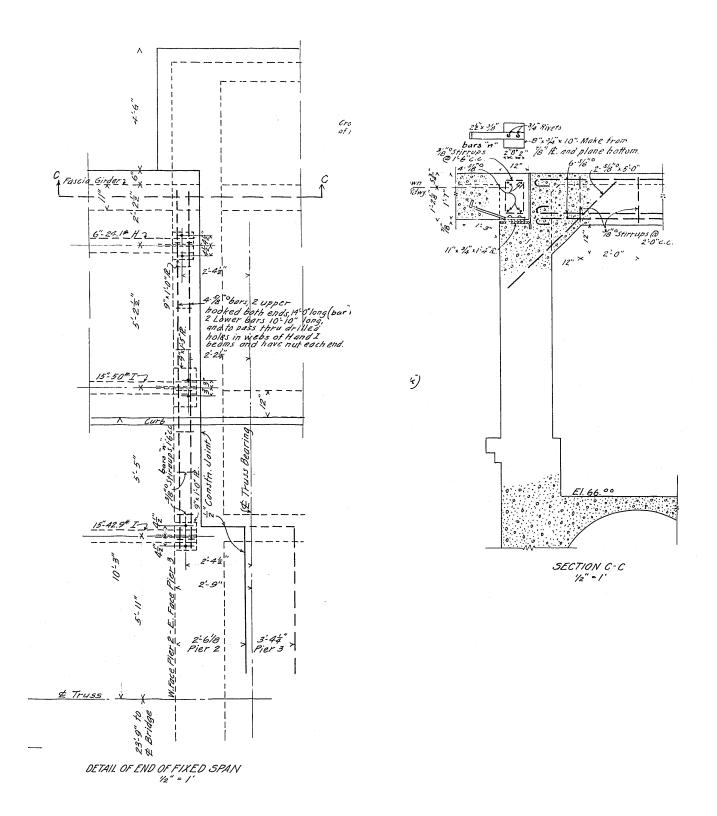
Joint in the Deck System at Piers 2 & 3, Fixed and Expansion Spans
